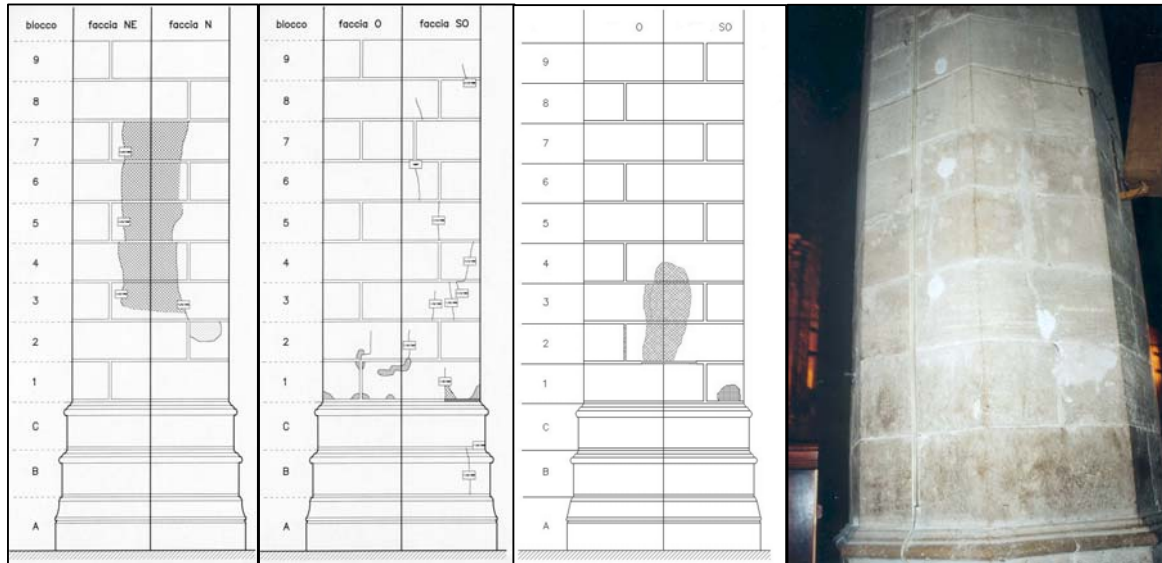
Examples of cracking in pier faces. The photograph corresponds to the wedge developed in the pier face sketched at the left
